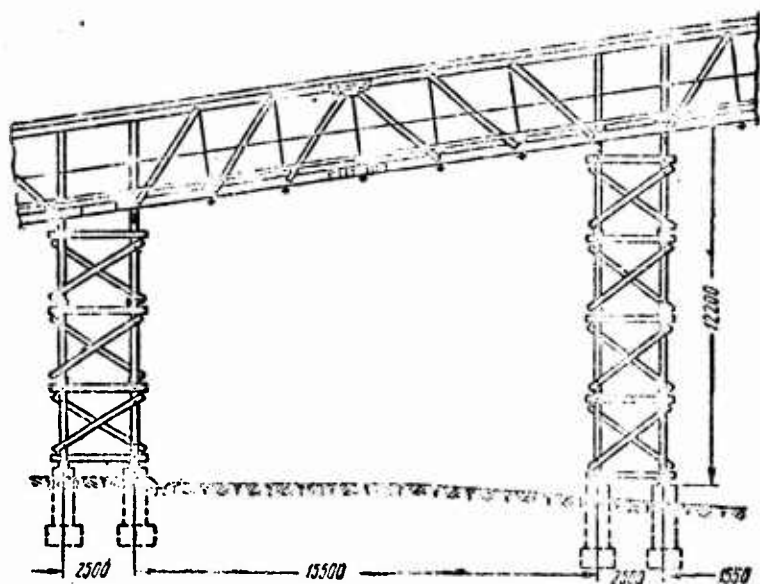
Conveyor gallery with wooden trusses of the span structure.
